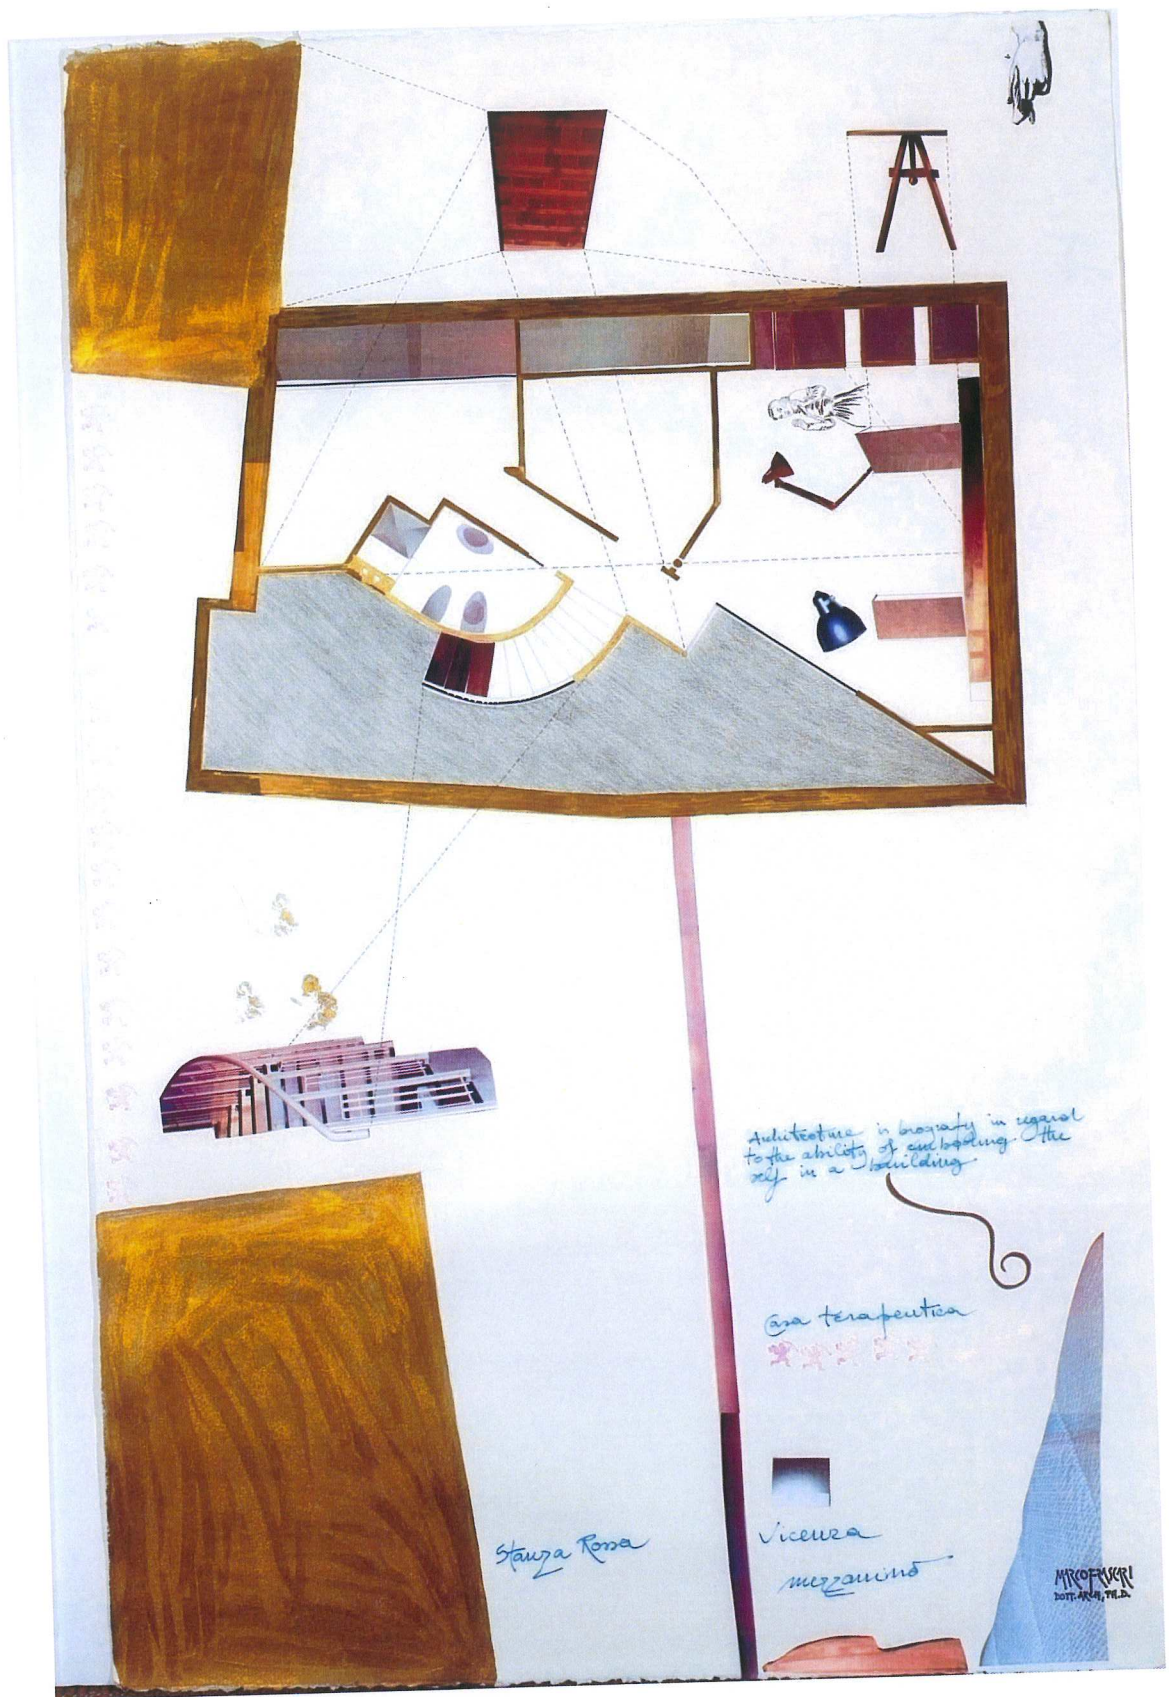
Casa Rossa, Post-Construction Technography, Mezzanine Plan
